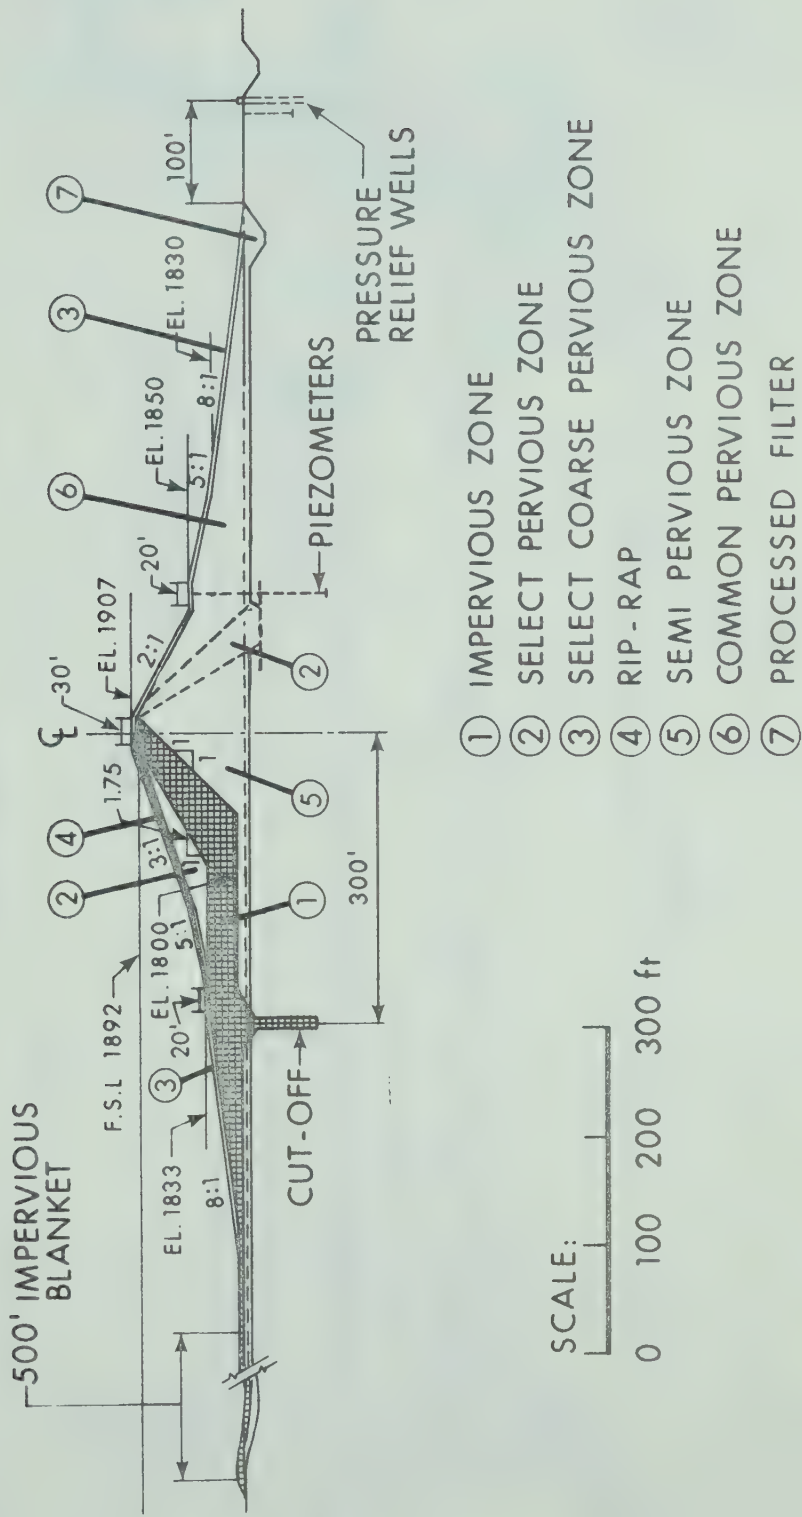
A TYPICAL CROSS SECTION OF DUNCAN DAM [AFTER GORDON AND DUGUID, 1970]
